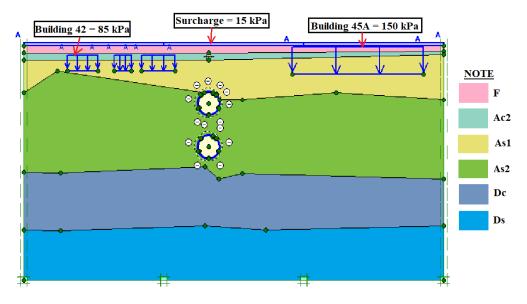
Model of soil layers and building load in Plaxis for section A-A of Metro Line 1.
